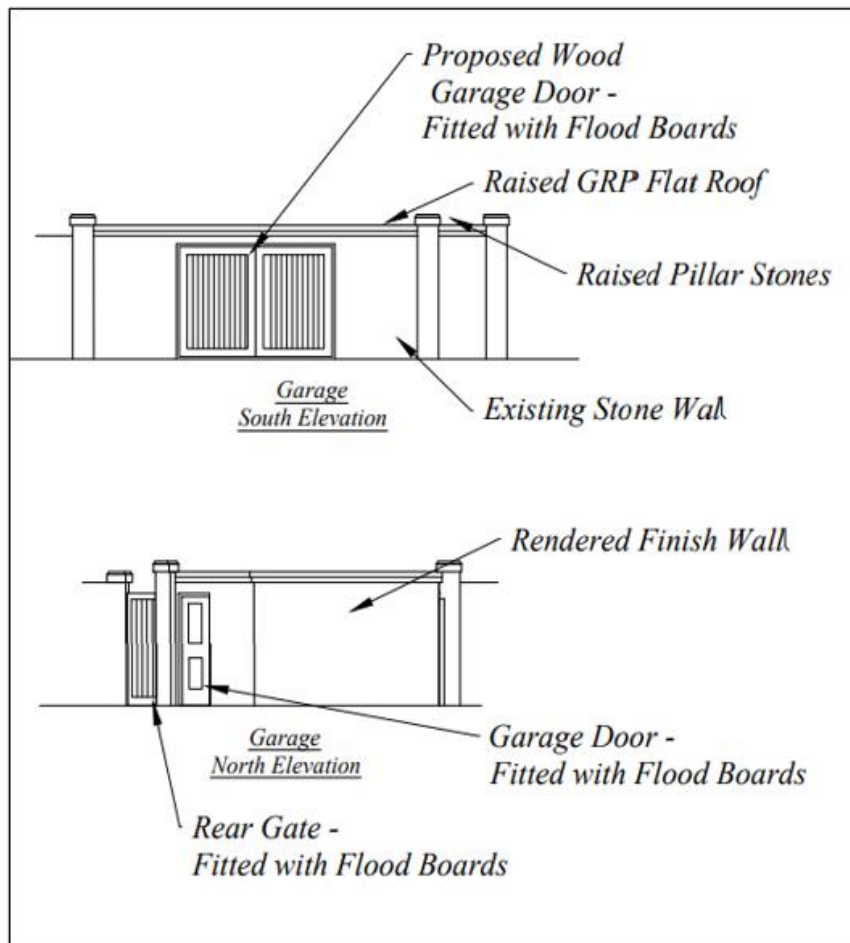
Proposed changes to the rear boundary wall associated with the construction of the new garage (Paul Osborne).
